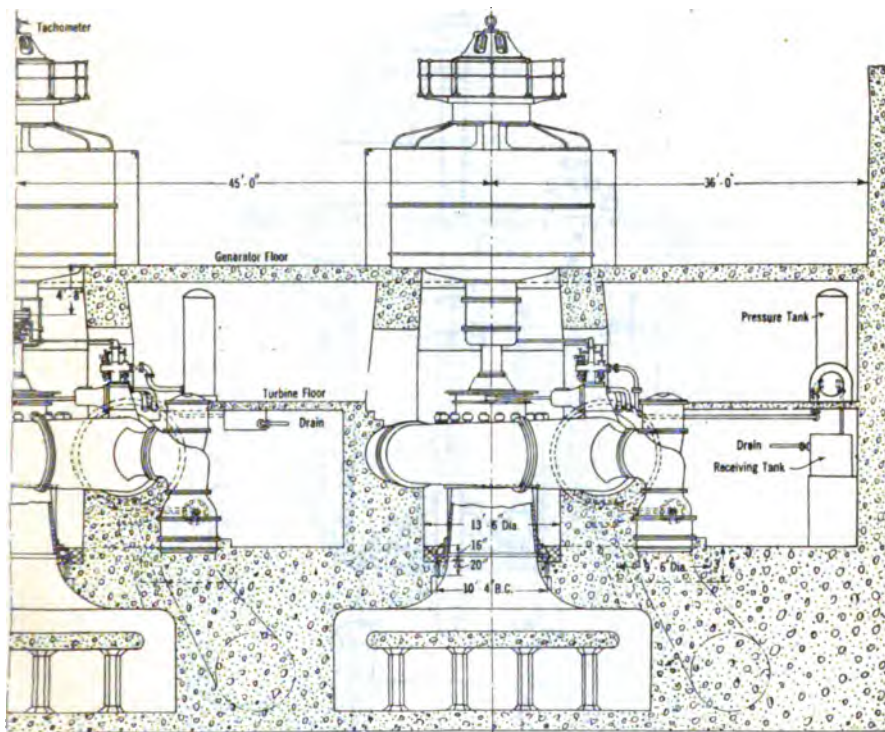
VIEW OF 40,000-H. P. 421.5-FT. HEAD, 257-REV. PER MIN. TURBINES
